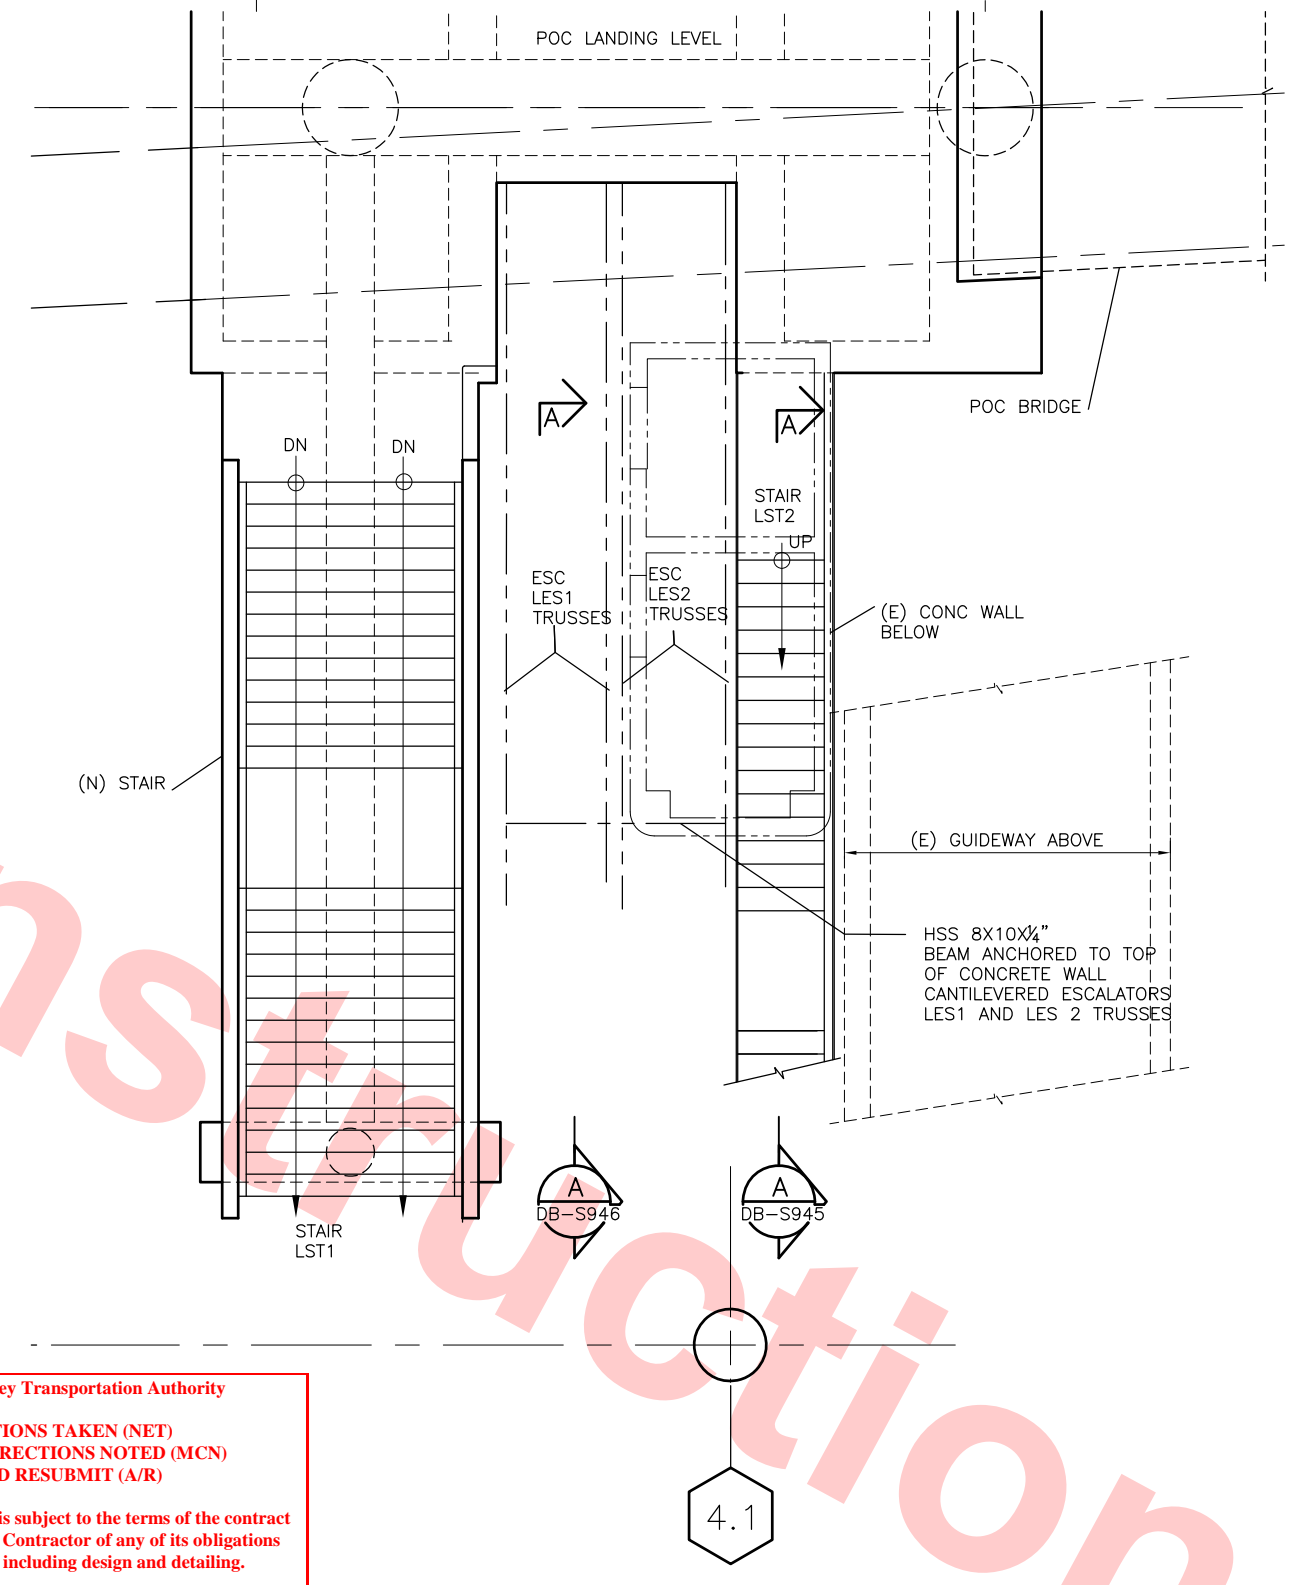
DETAIL LRT PLATFORM LEVEL PLAN 1
